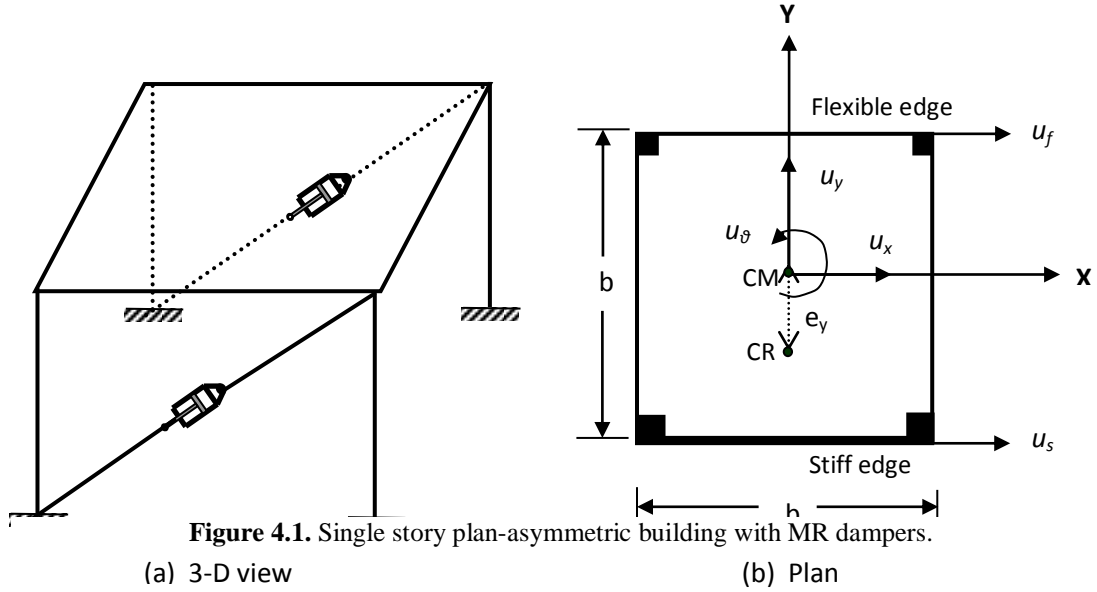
Single story plan-asymmetric building with MR dampers.
